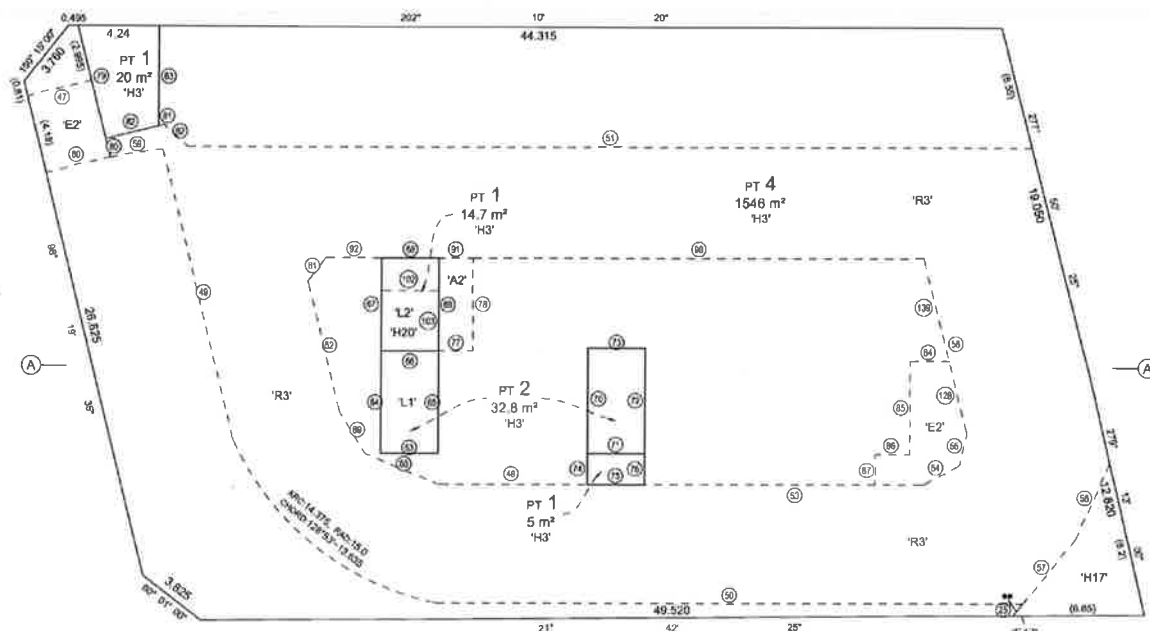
Registered stratum subdivision Basement Level 3 plan (Source: Proponent's Application)
